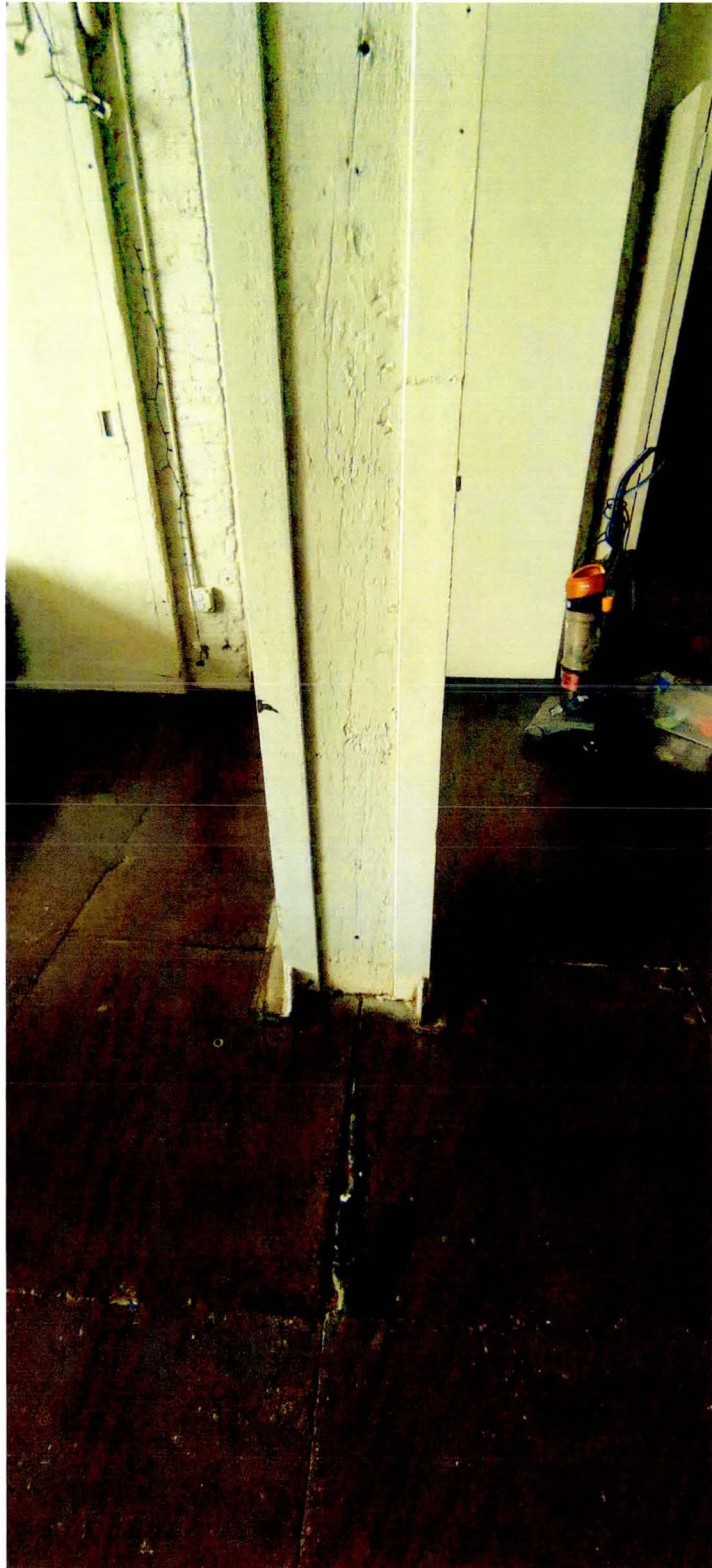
Unit 1036 - Wooden Pillar and cracks in bedroom 1
